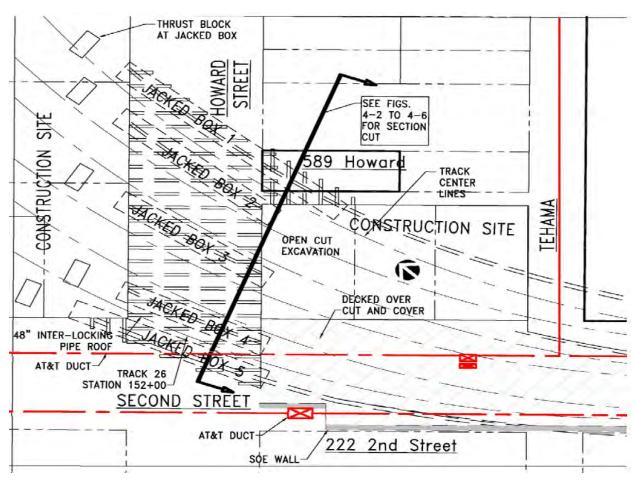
Jacked Box Pilot Tunnel with a Pipe Canopy – Plan View
